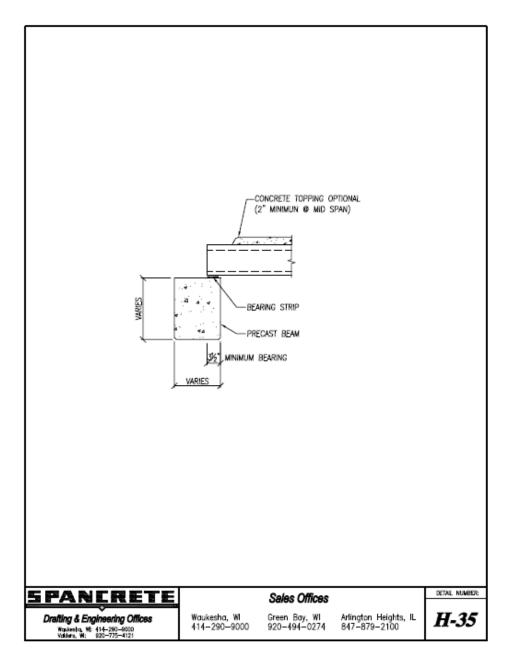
Spancrete Typical Hollow Core Plank to Precast Beam Bearing Detail
